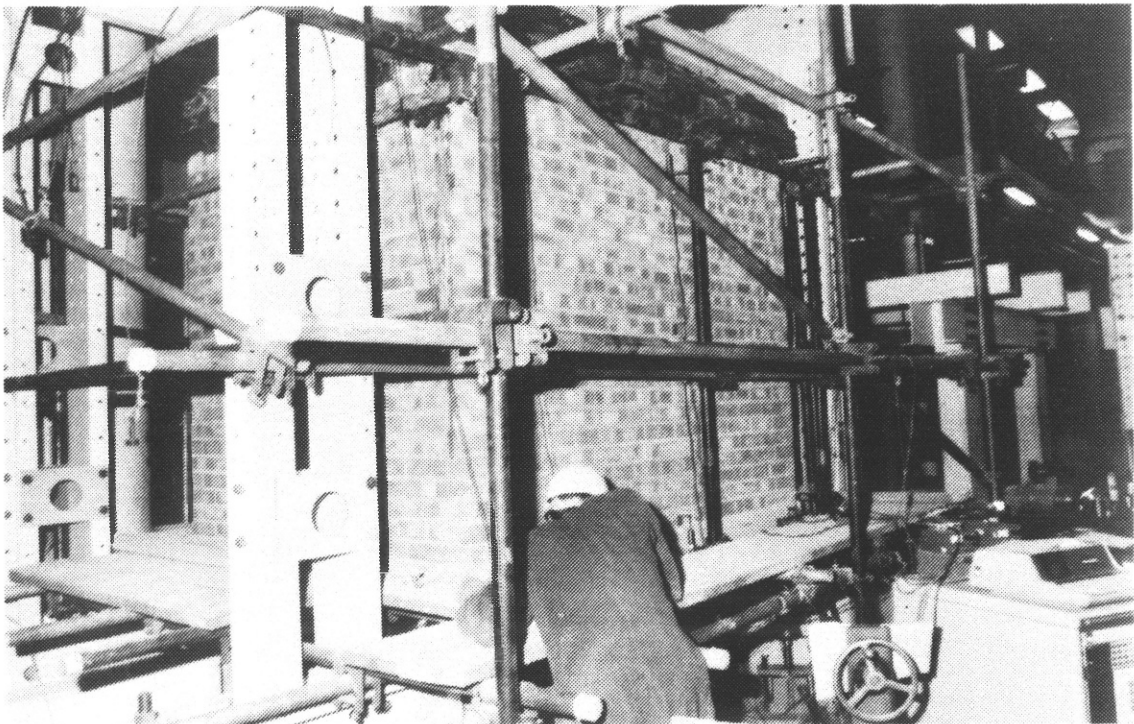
Vertical splitting crack along edge of adjacent wall (Test W4).
